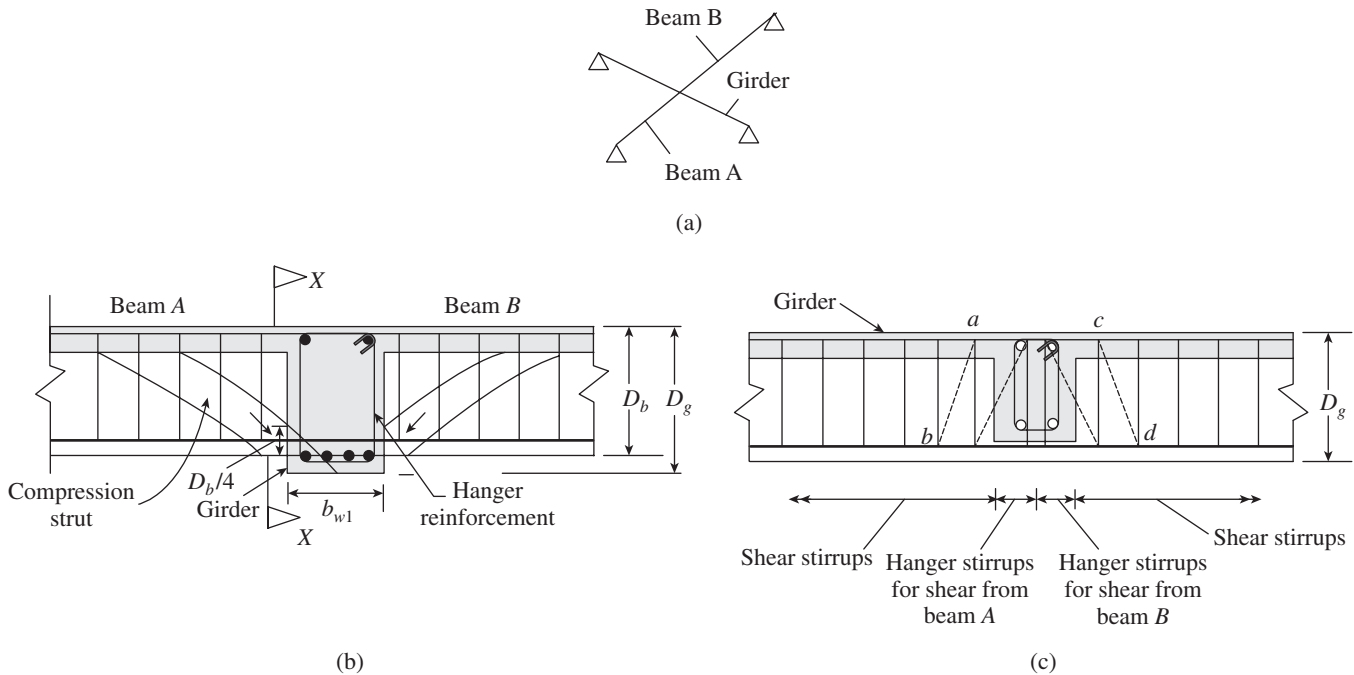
Girder supporting secondary beams (a) System of beams (b) Section through secondary beam (c) Section X-X through the girder
